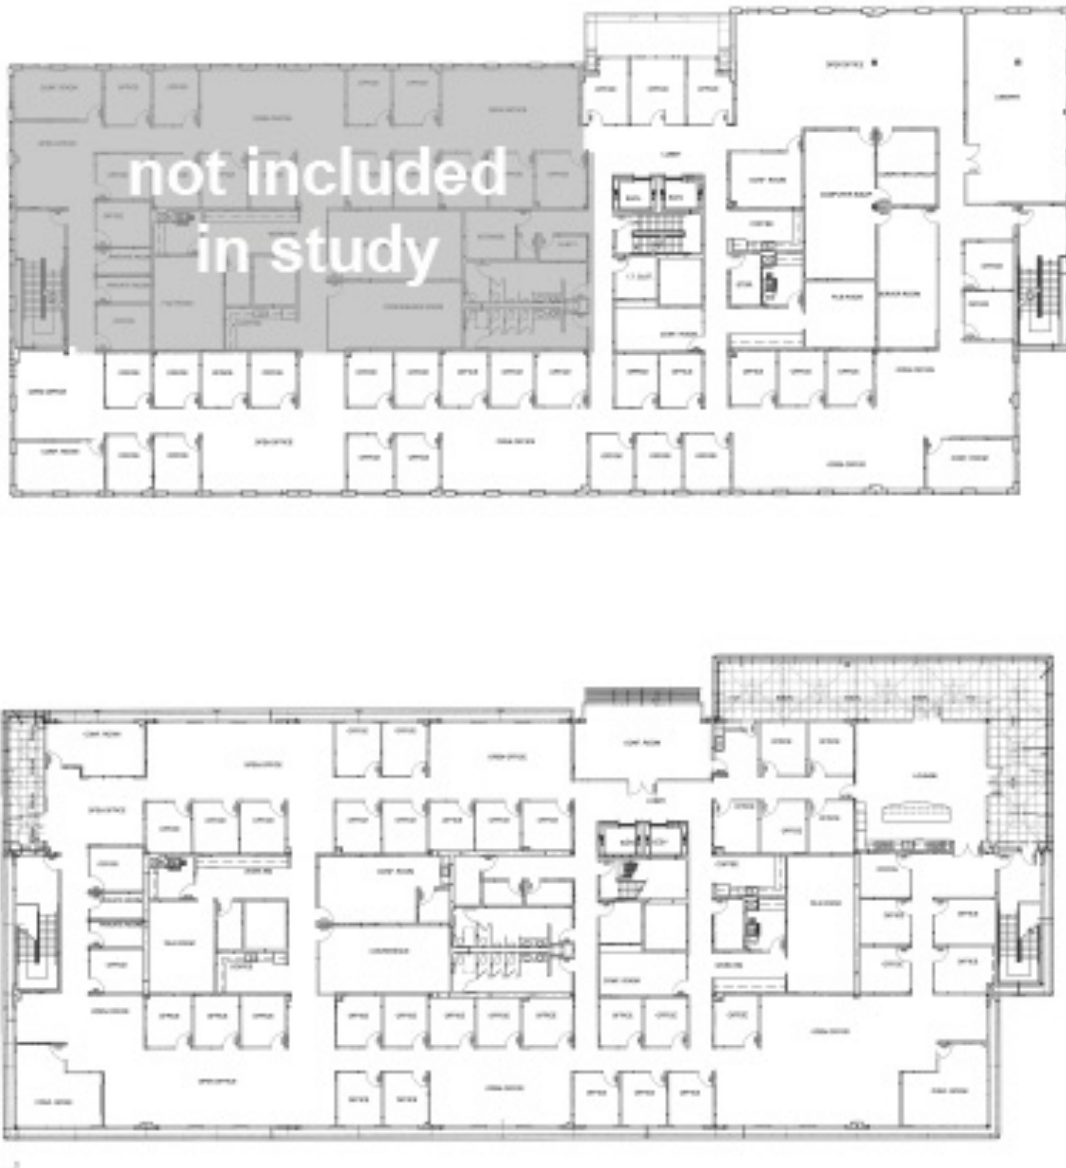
Study regions shown in building floor plans, 3rd floor (above) and 4th floor (below).
